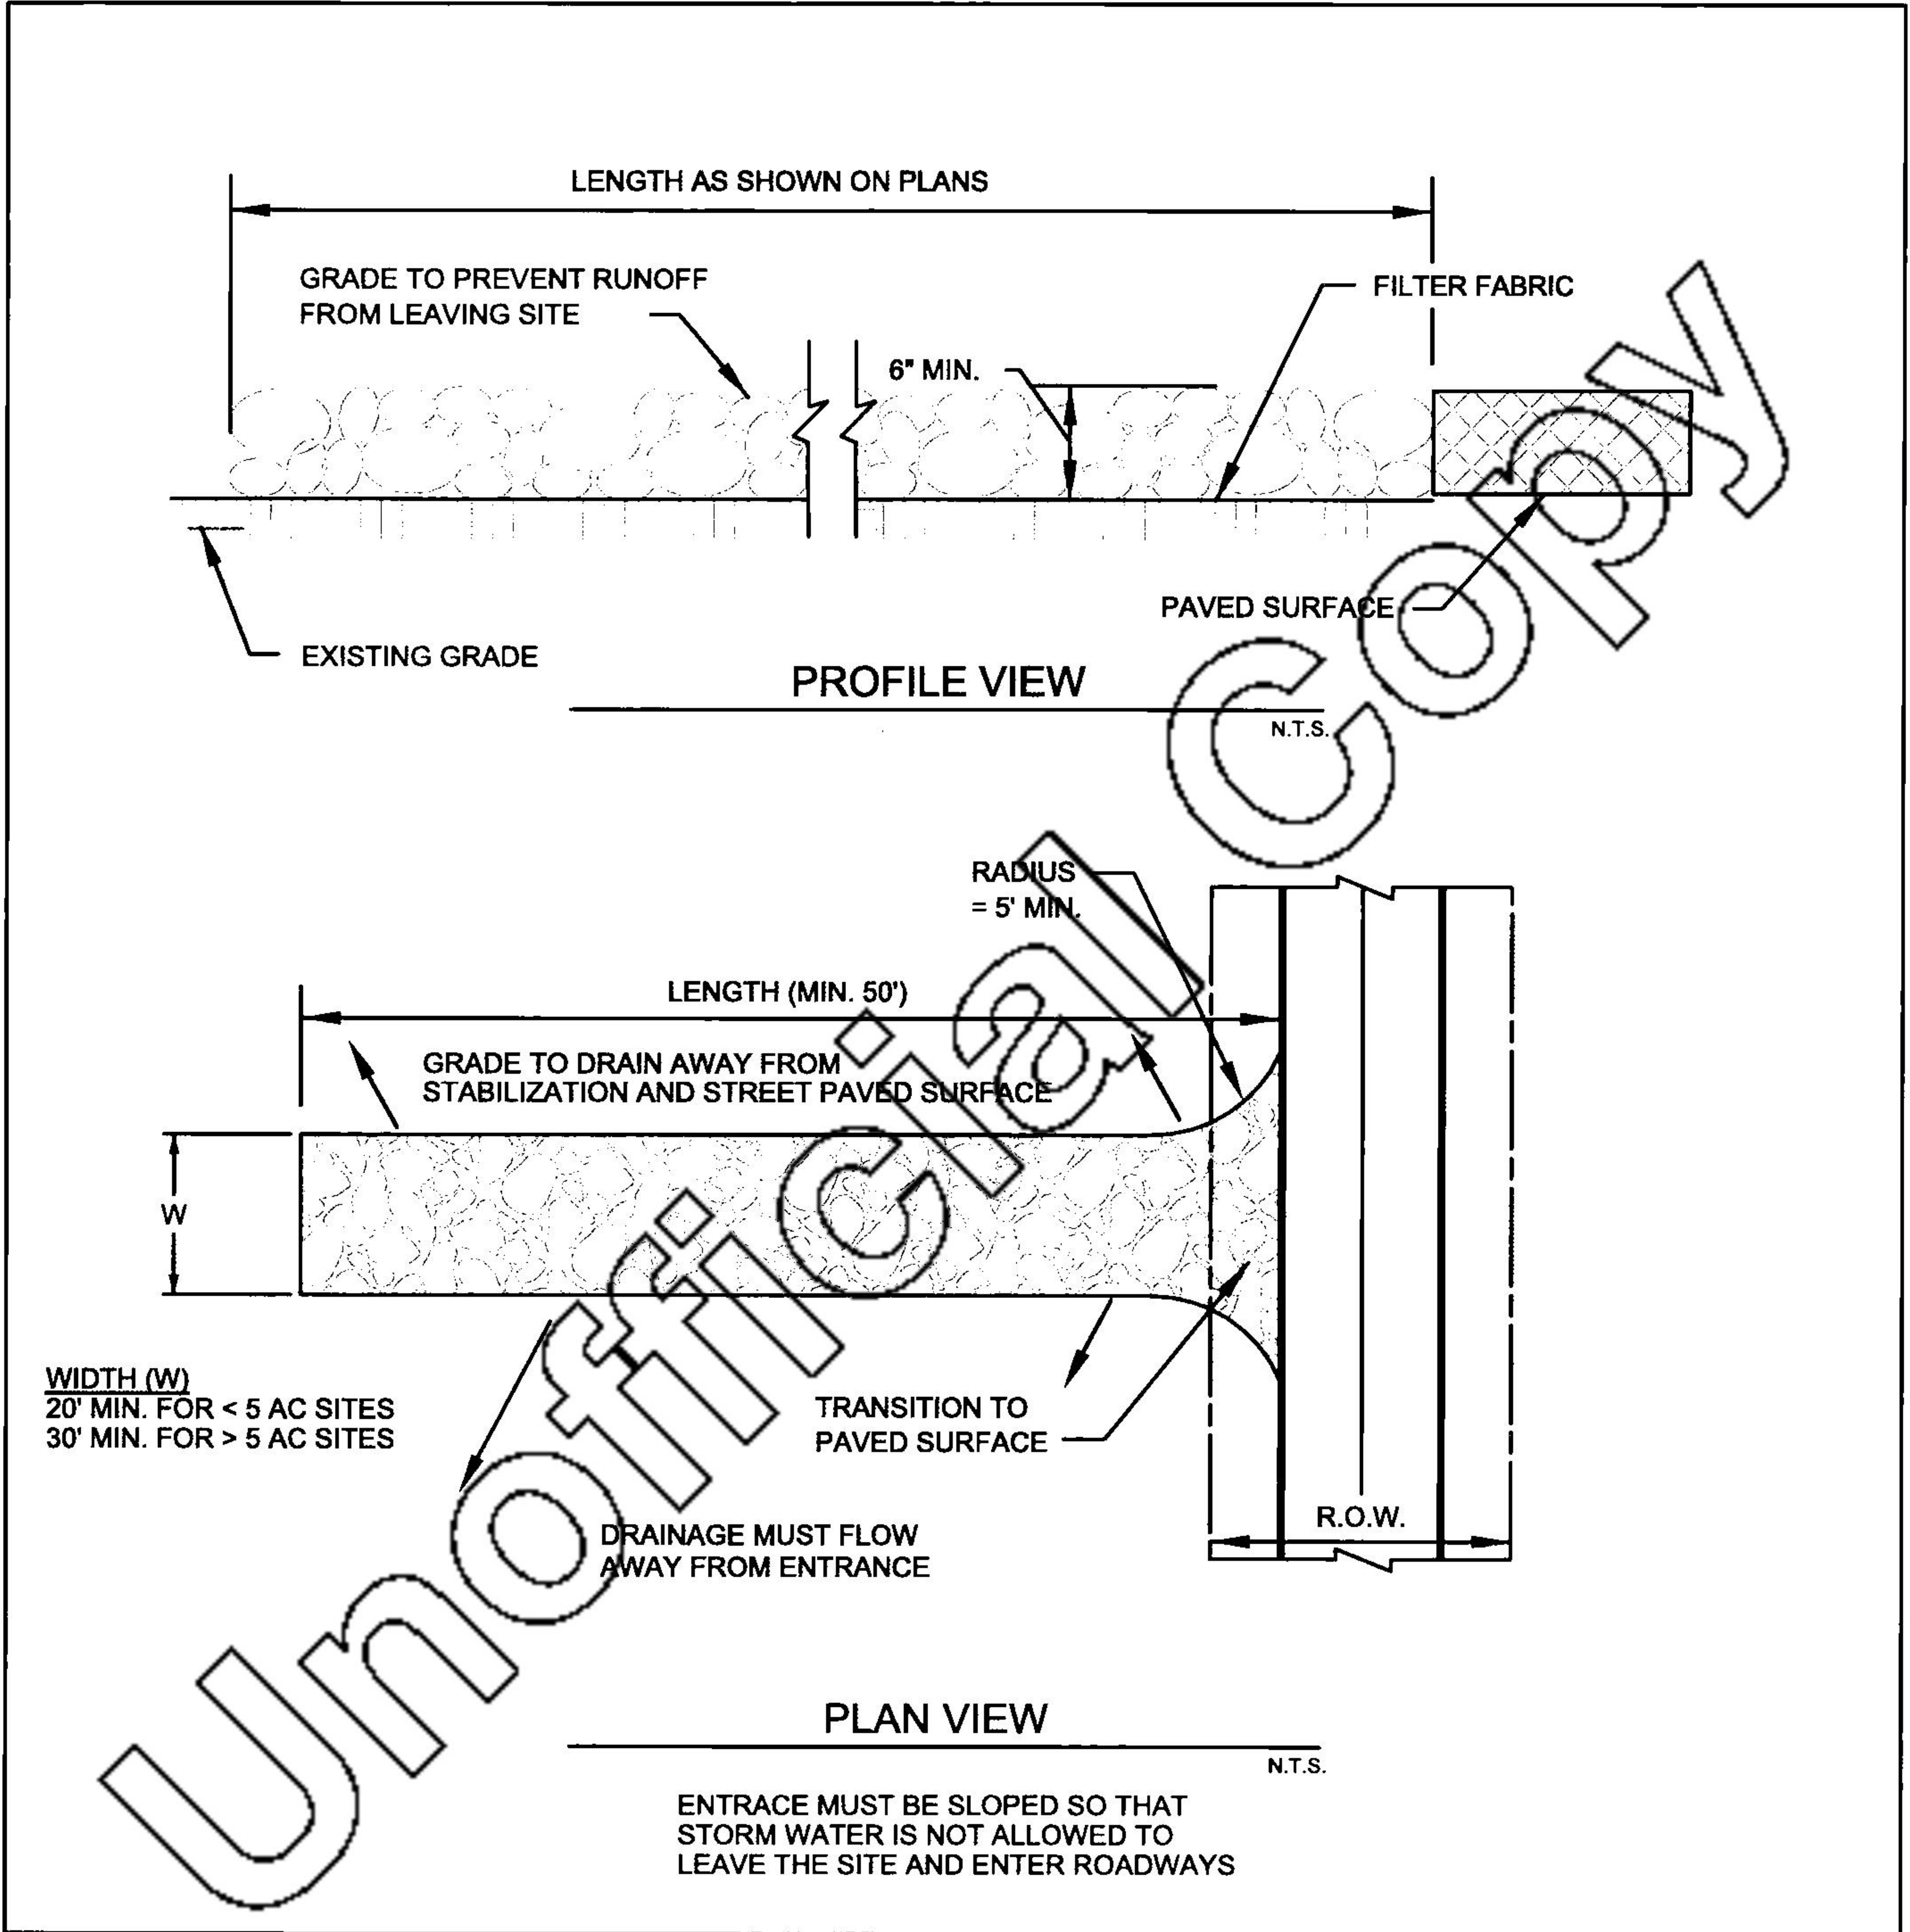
STANDARD CONSTRUCTION DETAIL - STABILIZED CONSTRUCTION EXIT (1 OF 2)
